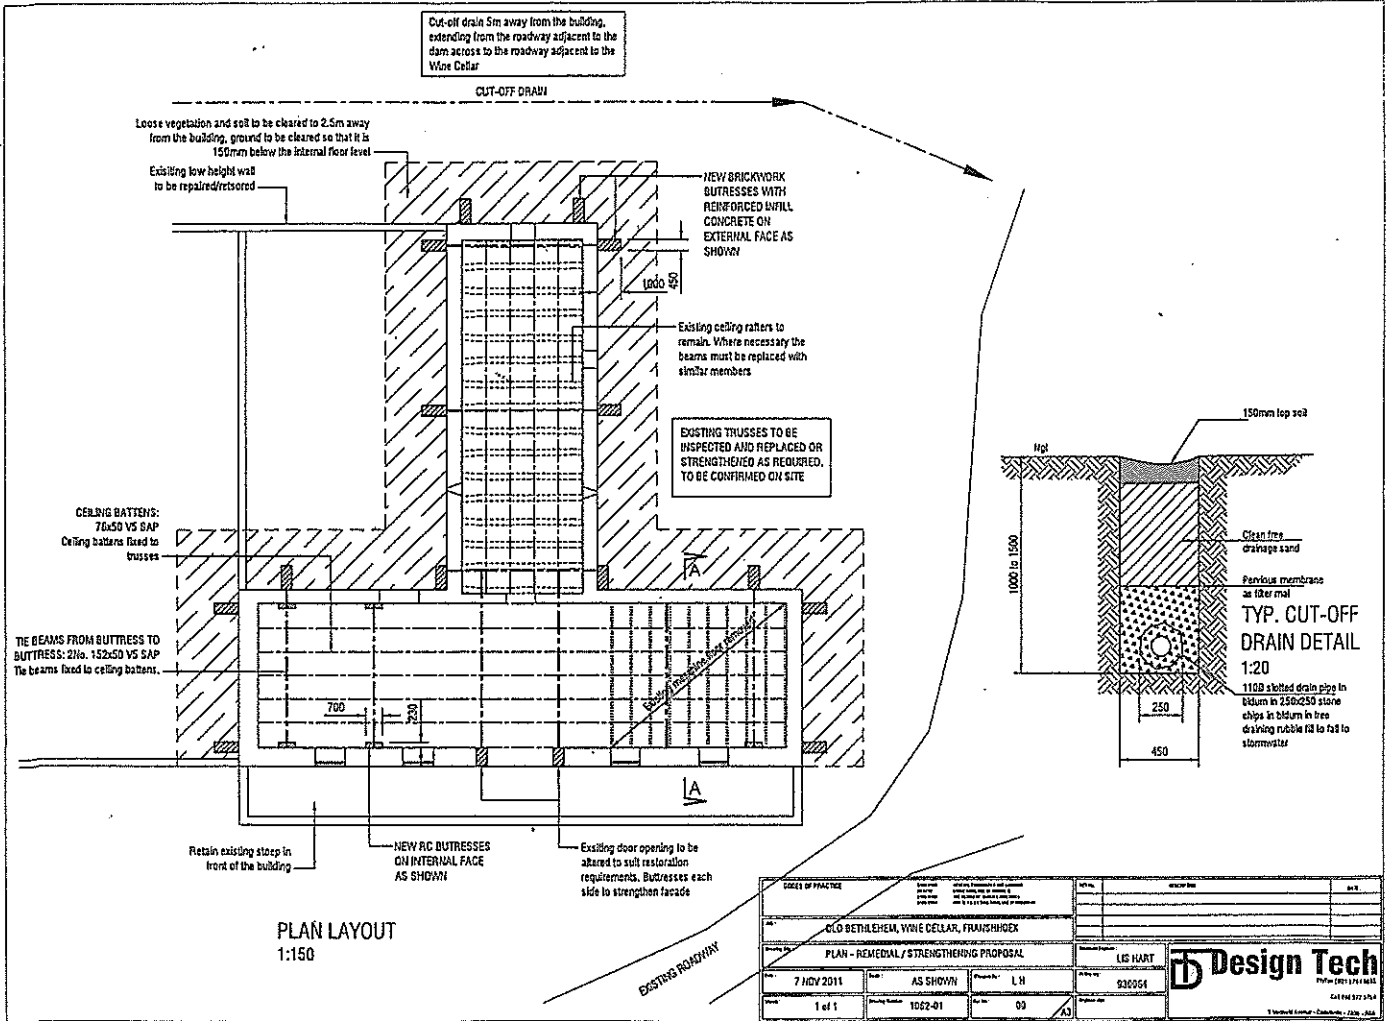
Proposal by the Consulting Engineers of how i.a. the buttresses would stabilize the ruinous building (Design Tech 2011).
